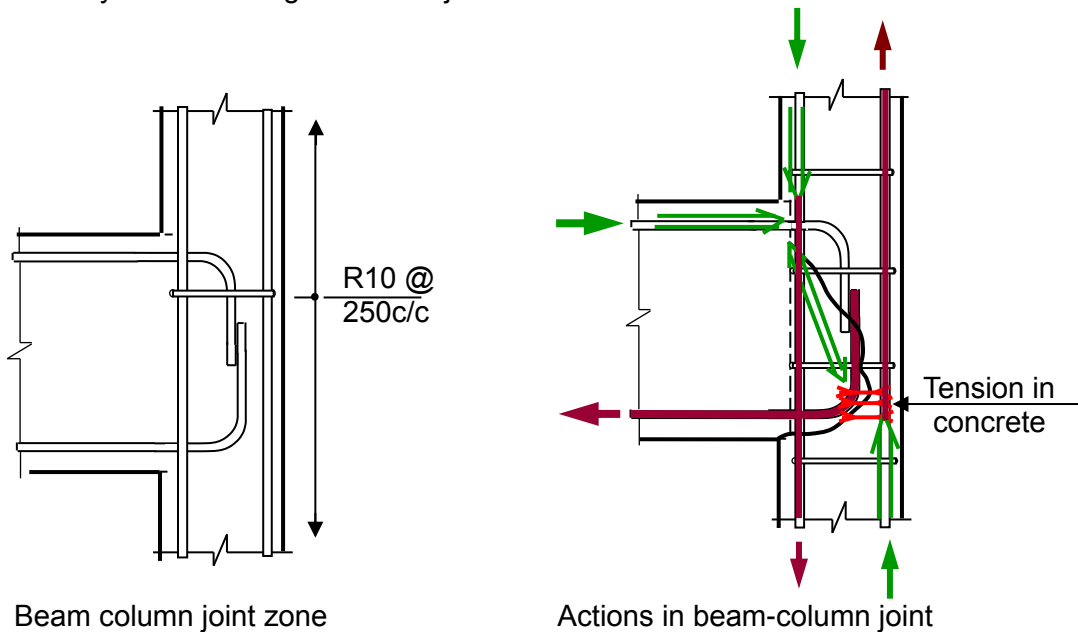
Beam column joint zone in the West wall of building (see 2 on Figure 23)
